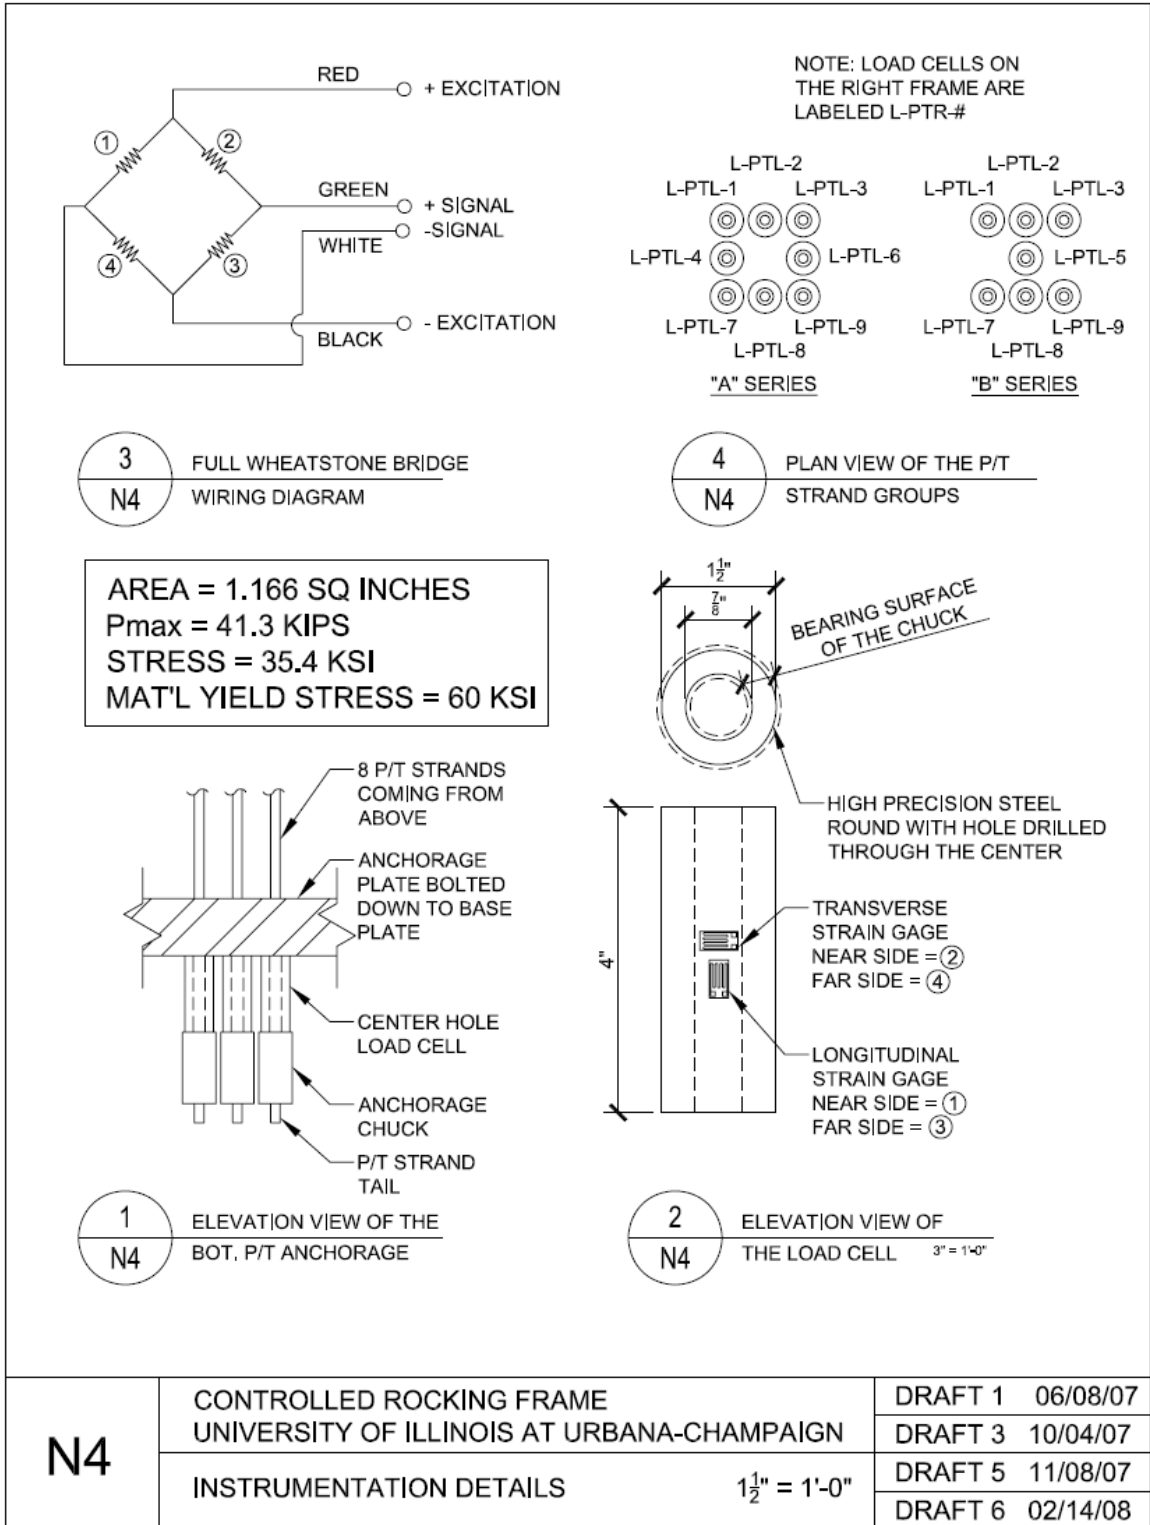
Instrumentation Plan Drawing – Post-Tensioning Load Cells
